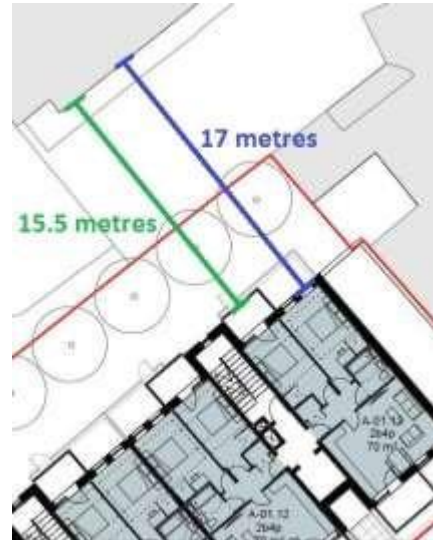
Proposed first floor plan, showing the window-to-balcony distance (green) and window-to-window distance (blue) between Block A and the 1-8 Jephson Street flats.
